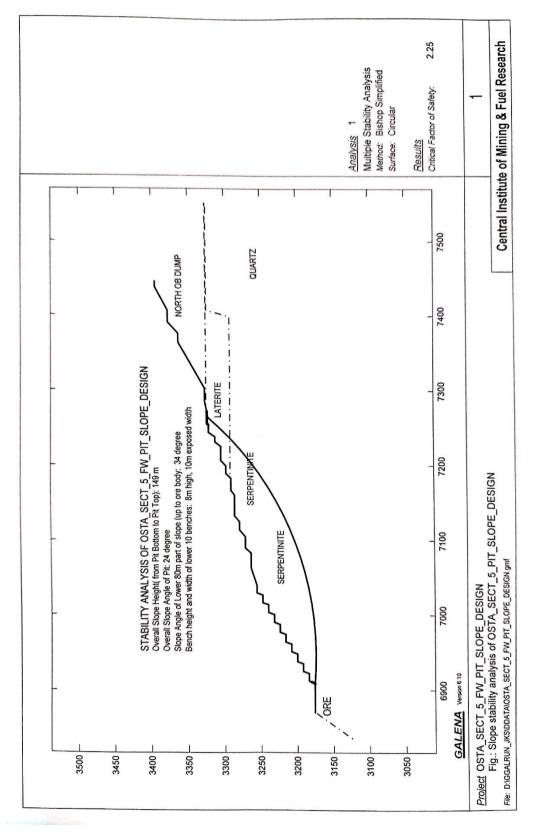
Design of Ultimate Footwal Pit along Section Sect-5
